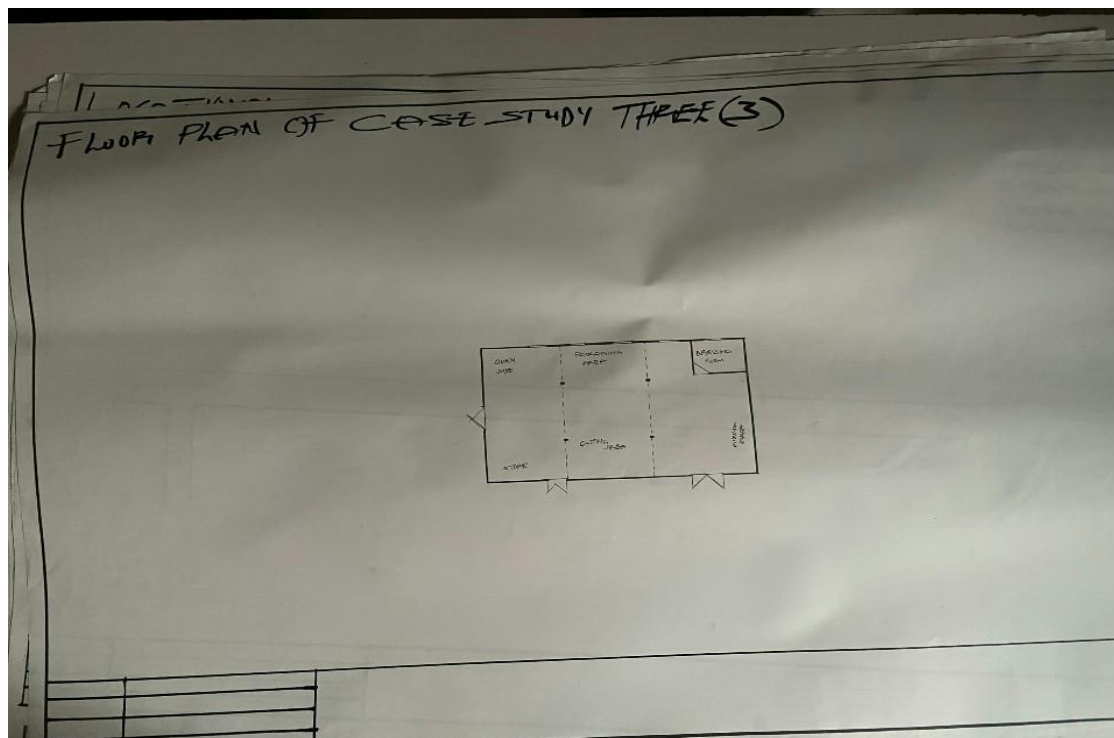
6: FLOOR PLAN OF CASE STUDY THREE
